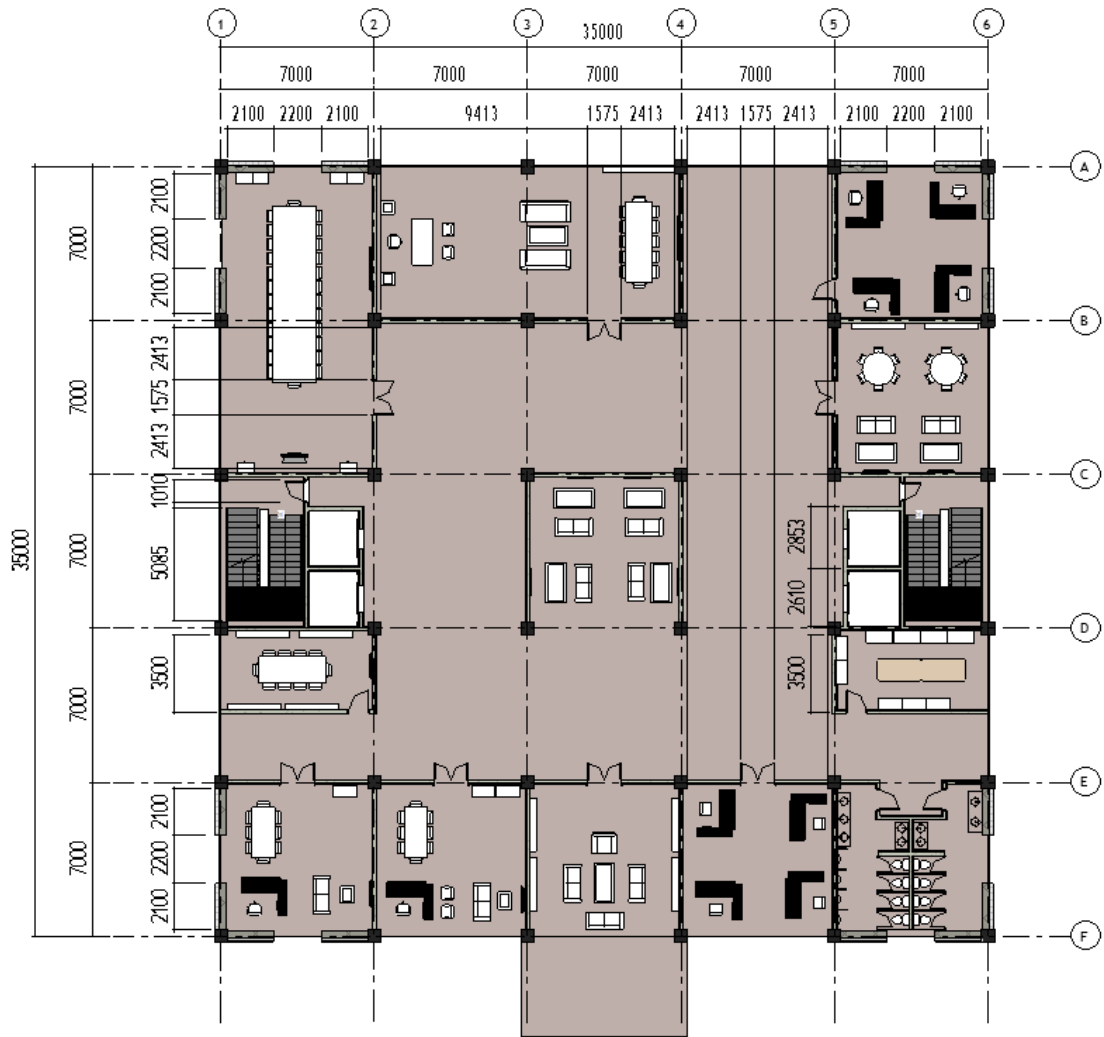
Floor plan of the typical floor (3-12 floors).
